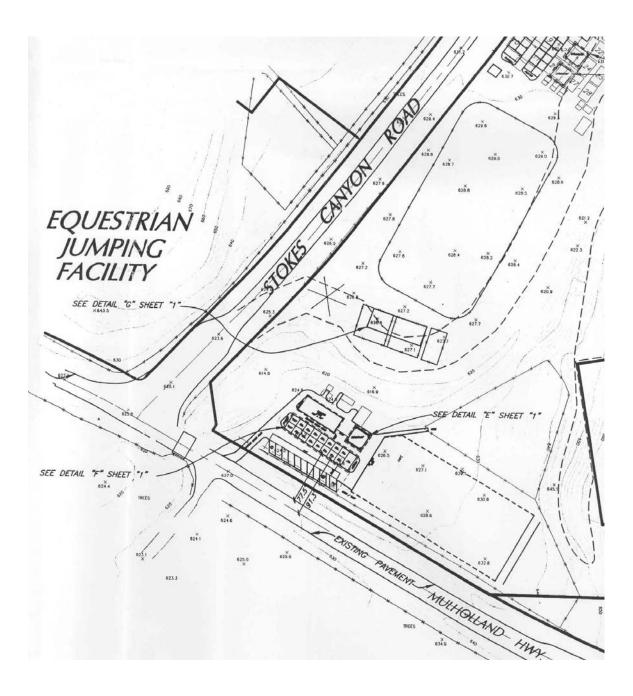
CDPA No. 4-02-131 Site Detail - South (Proposed)
